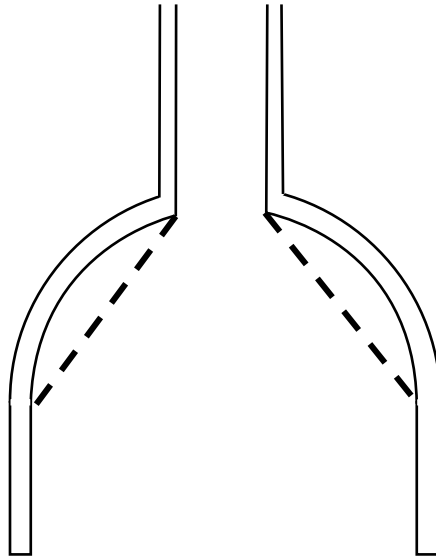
Cross section of tunnel showing base of fill at full width of tunnel but not filling the haunches
